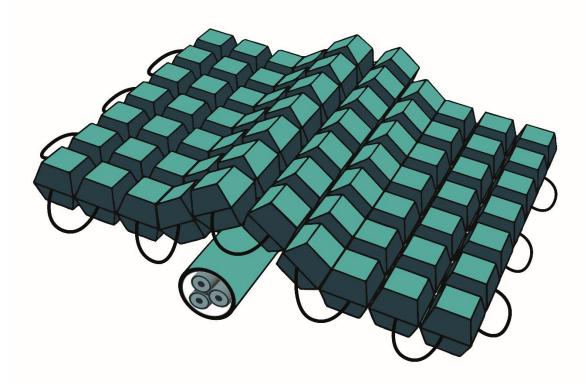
Cable Protection, Concrete Mattress Cross Section
